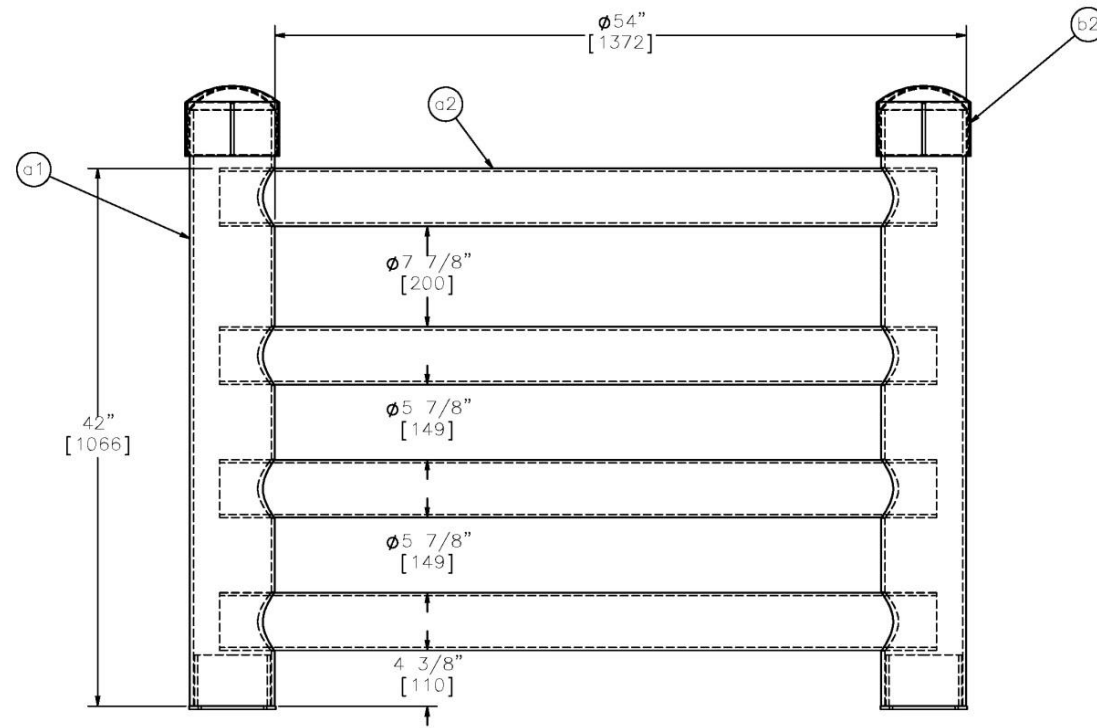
Modular PVC Rail, Design Concept PVC2-a (Sheet 1 of 4)
